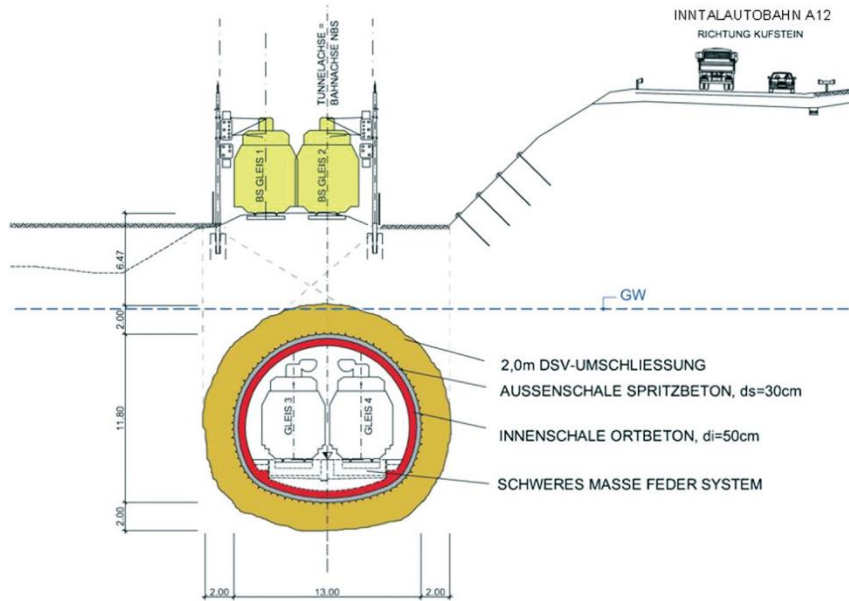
Jet grout surround at the section passing under the existing railway line (Palla and Leitner, 2009).
